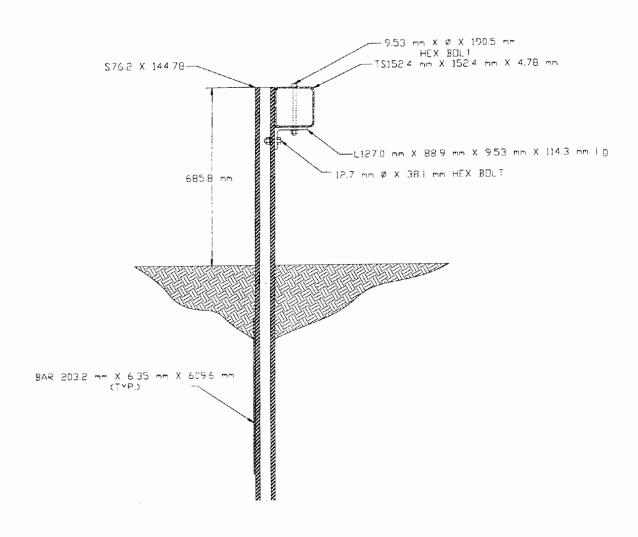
Cross-section of the box-beam (G3) guardrail system.
